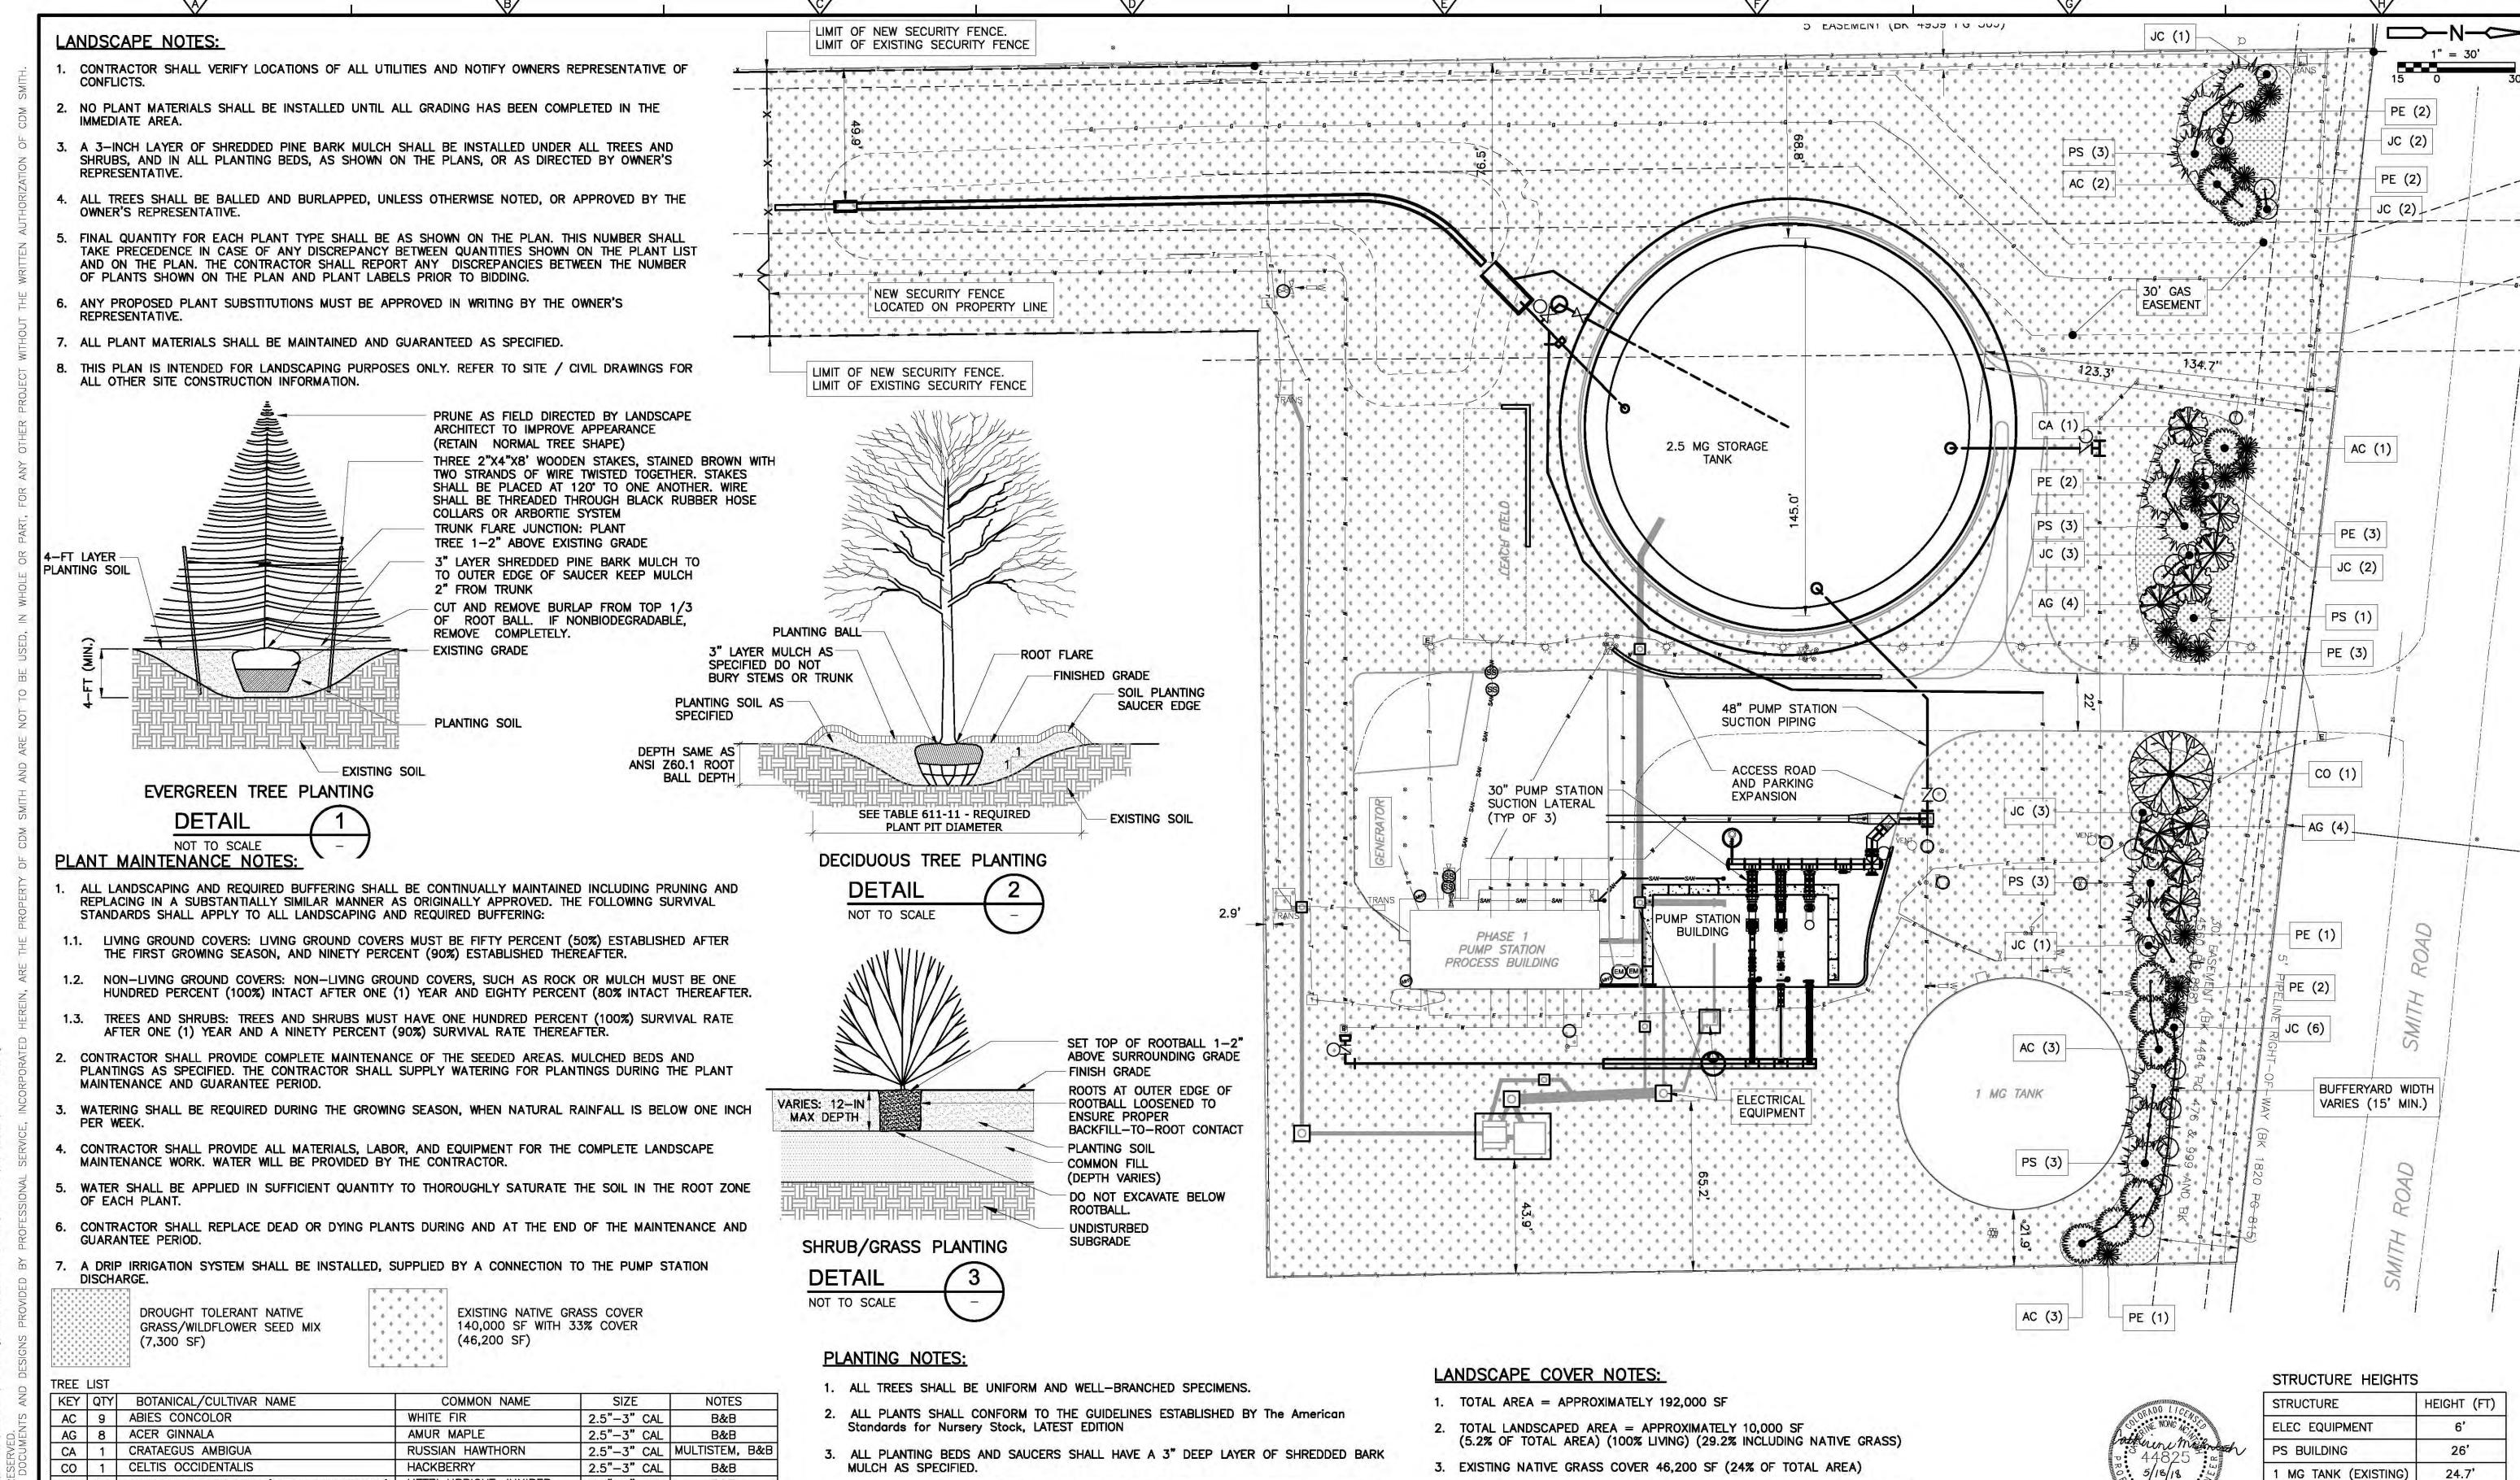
SBPS Site Plan, Landscape, Equipment to be Installed under this IGA
